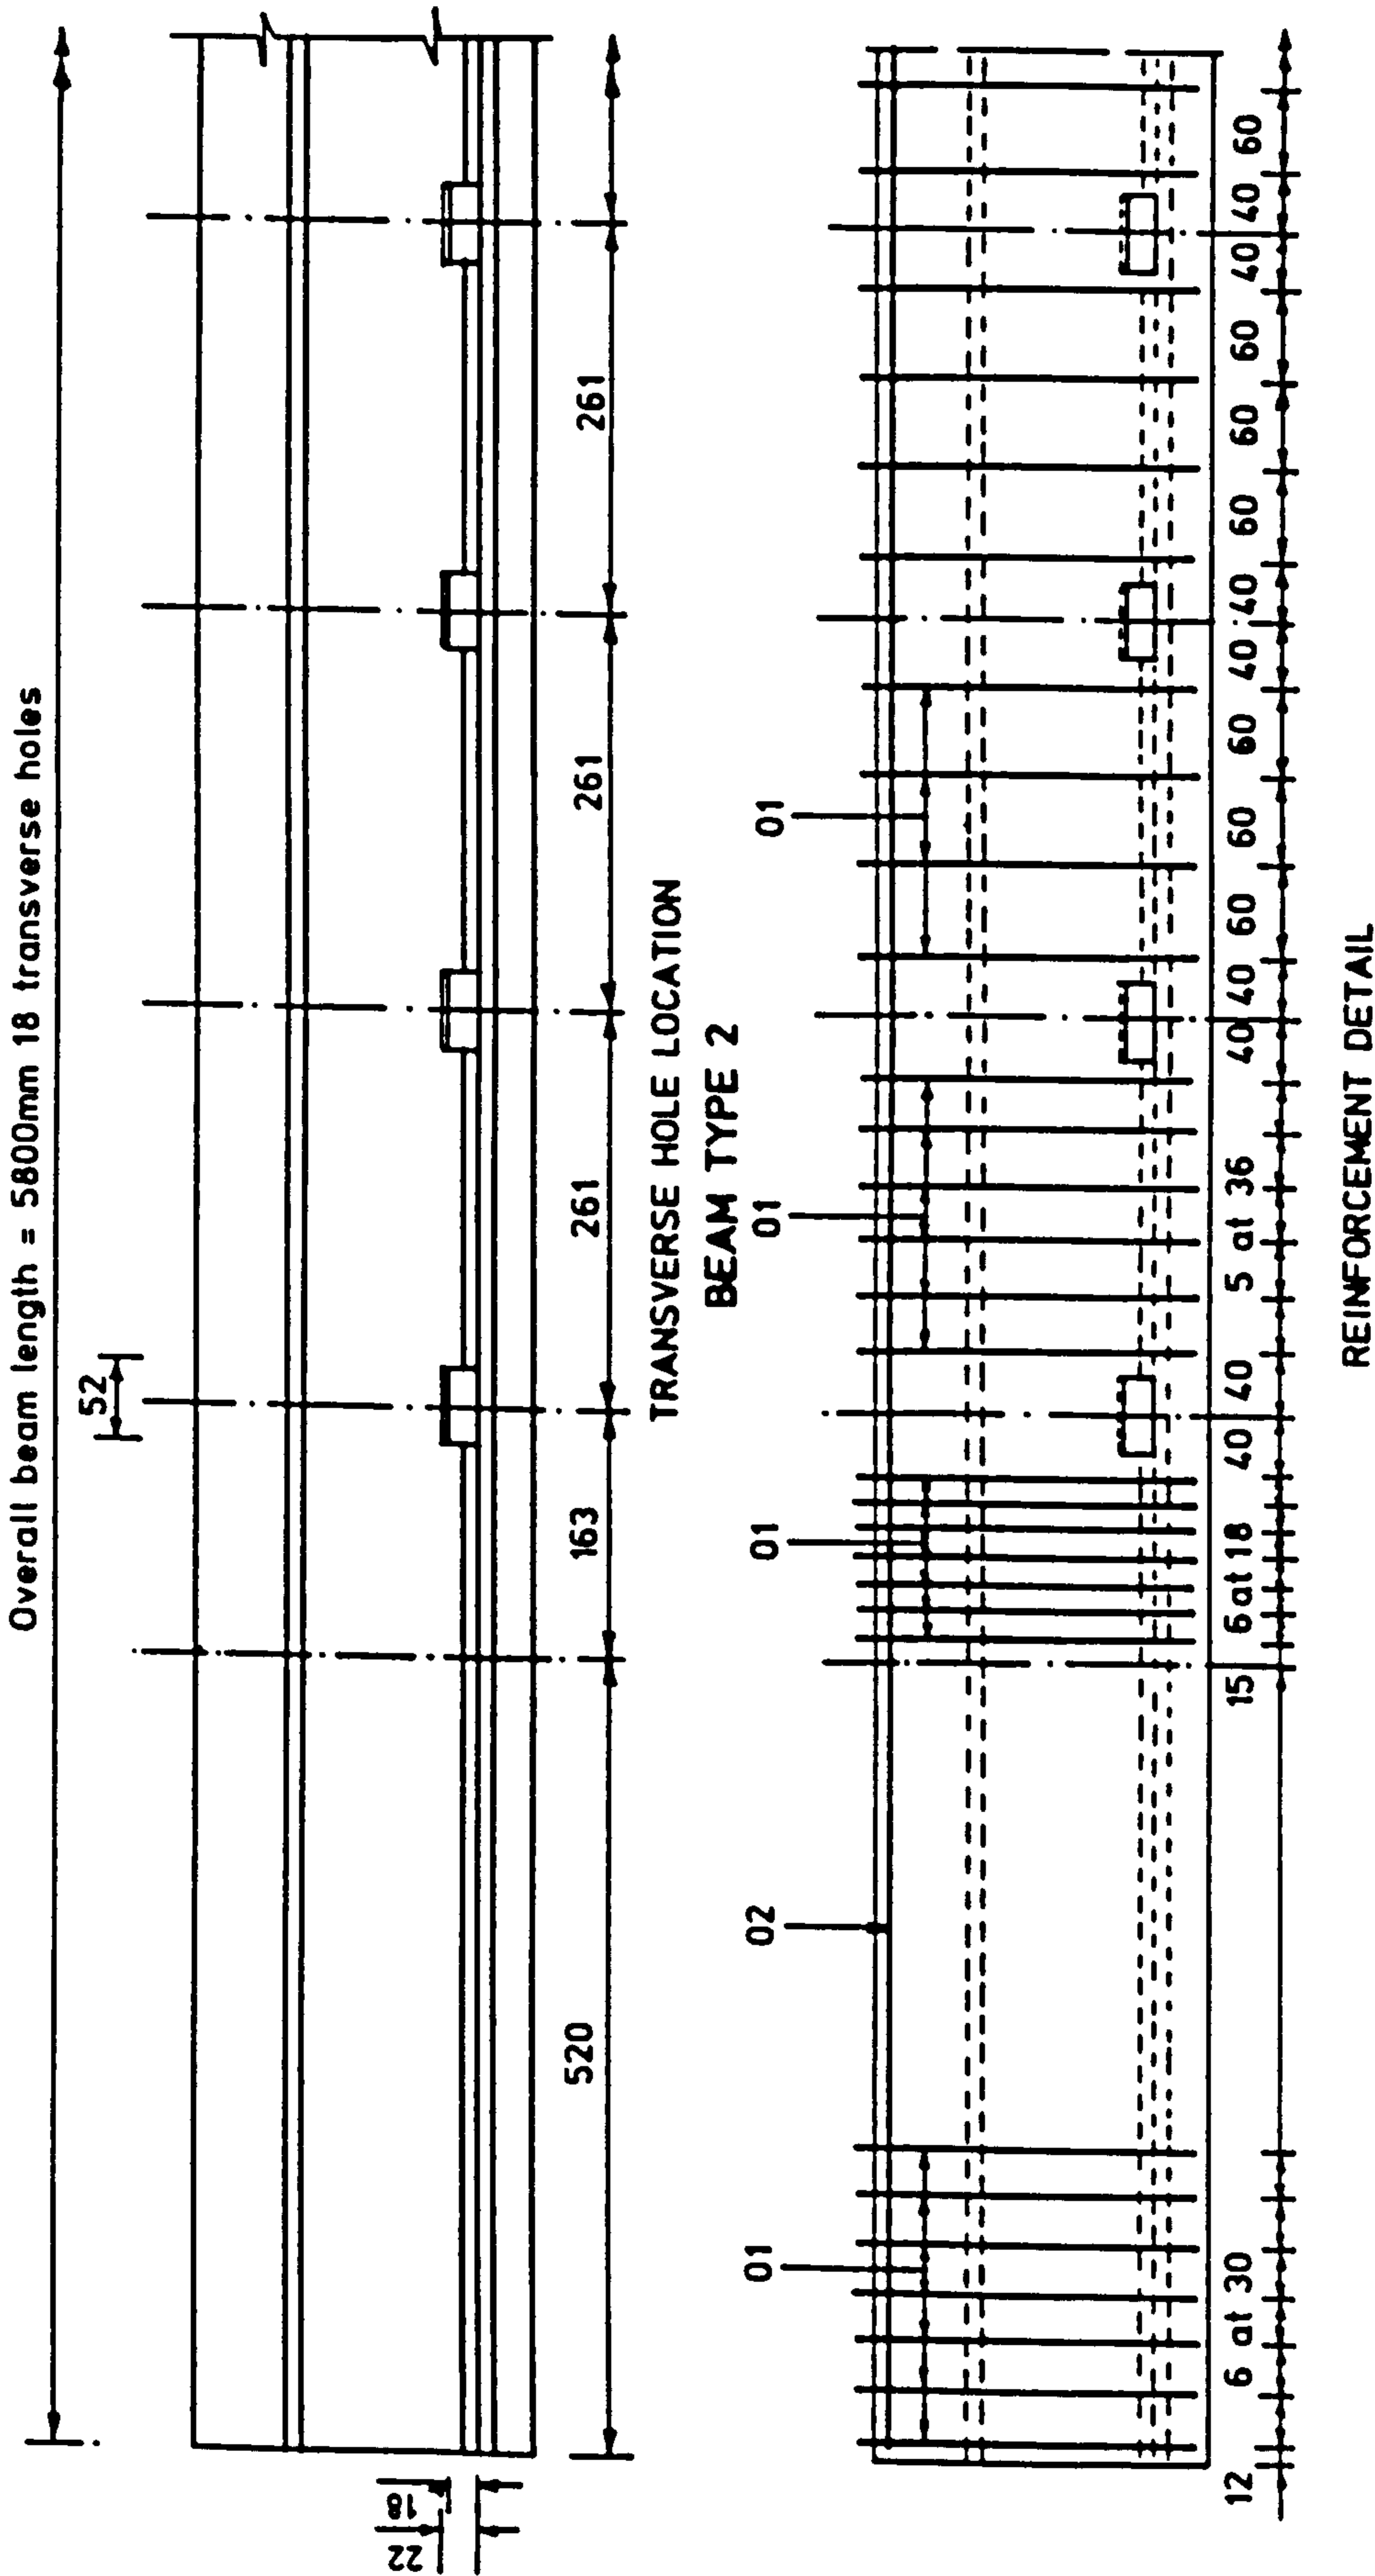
DETAILS OF MODEL DECK 2 PRECAST BEAM TYPE 2 TRANSVERSE HOLE AND SHEAR REINFORCEMENT LAYOUT.
